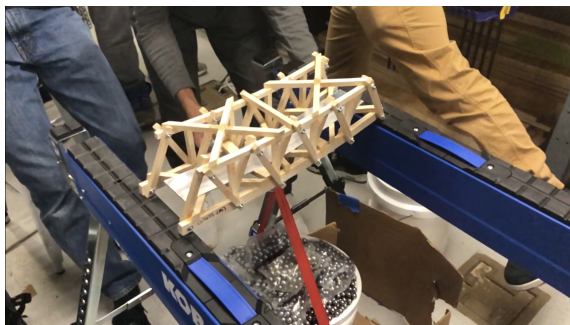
Testing our First Bridge. Taken Before Cross Member Failure.
